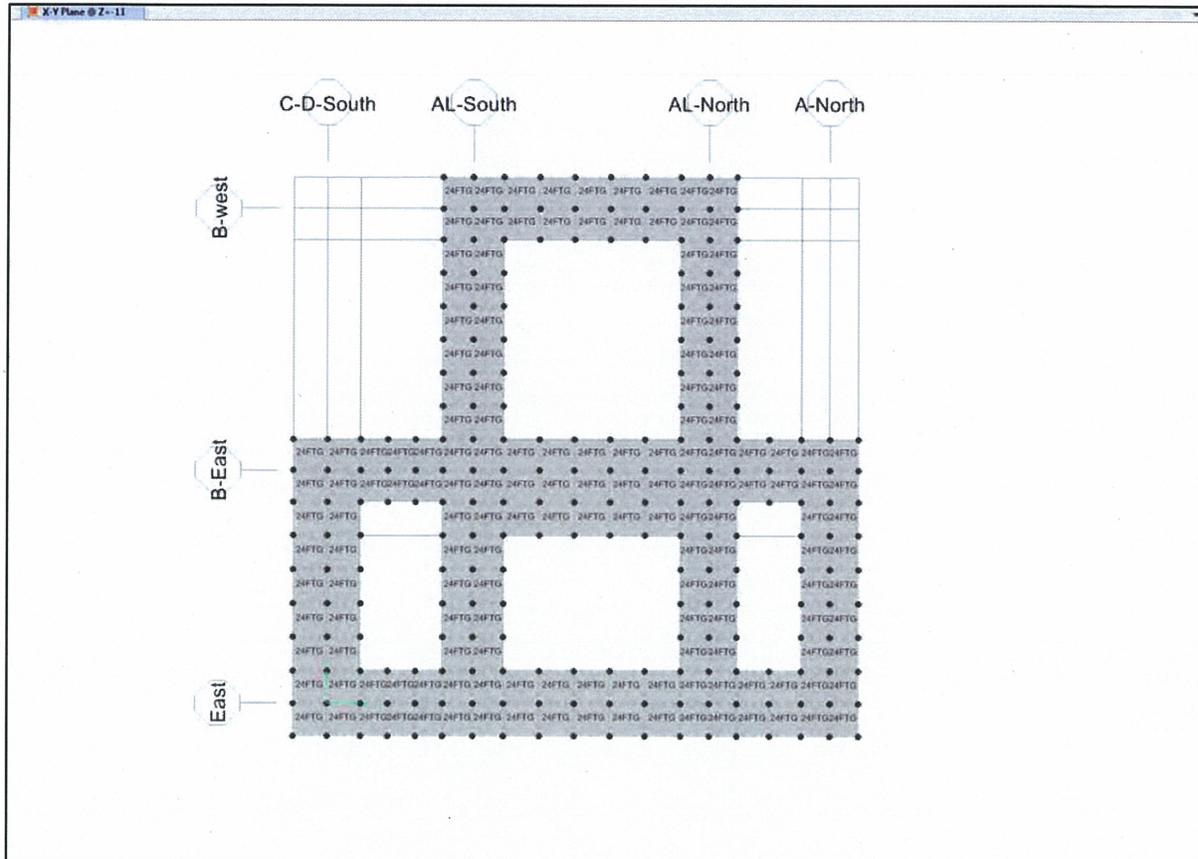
REC SAP2000 Foundation Plan at Z = -11-ft
